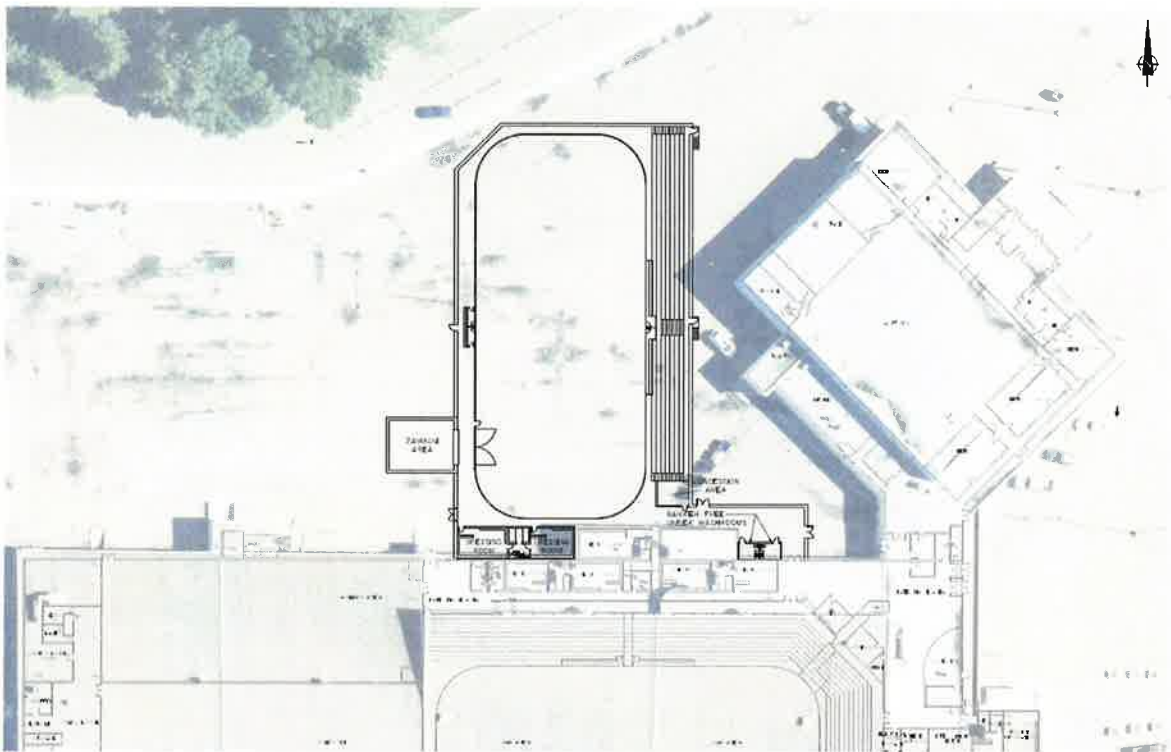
Option #3 Layout: New Building for Full Ice Arena
